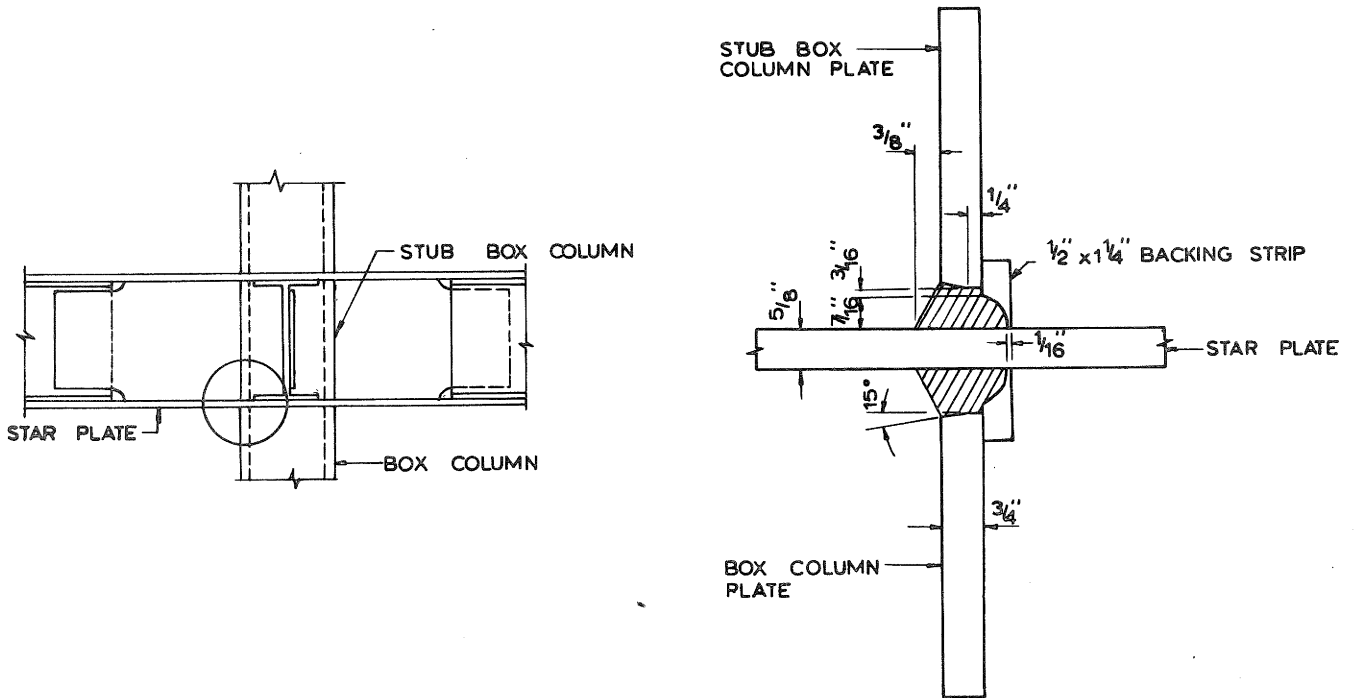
DETAIL OF COLUMN TO STAR PLATE BUTT WELD
